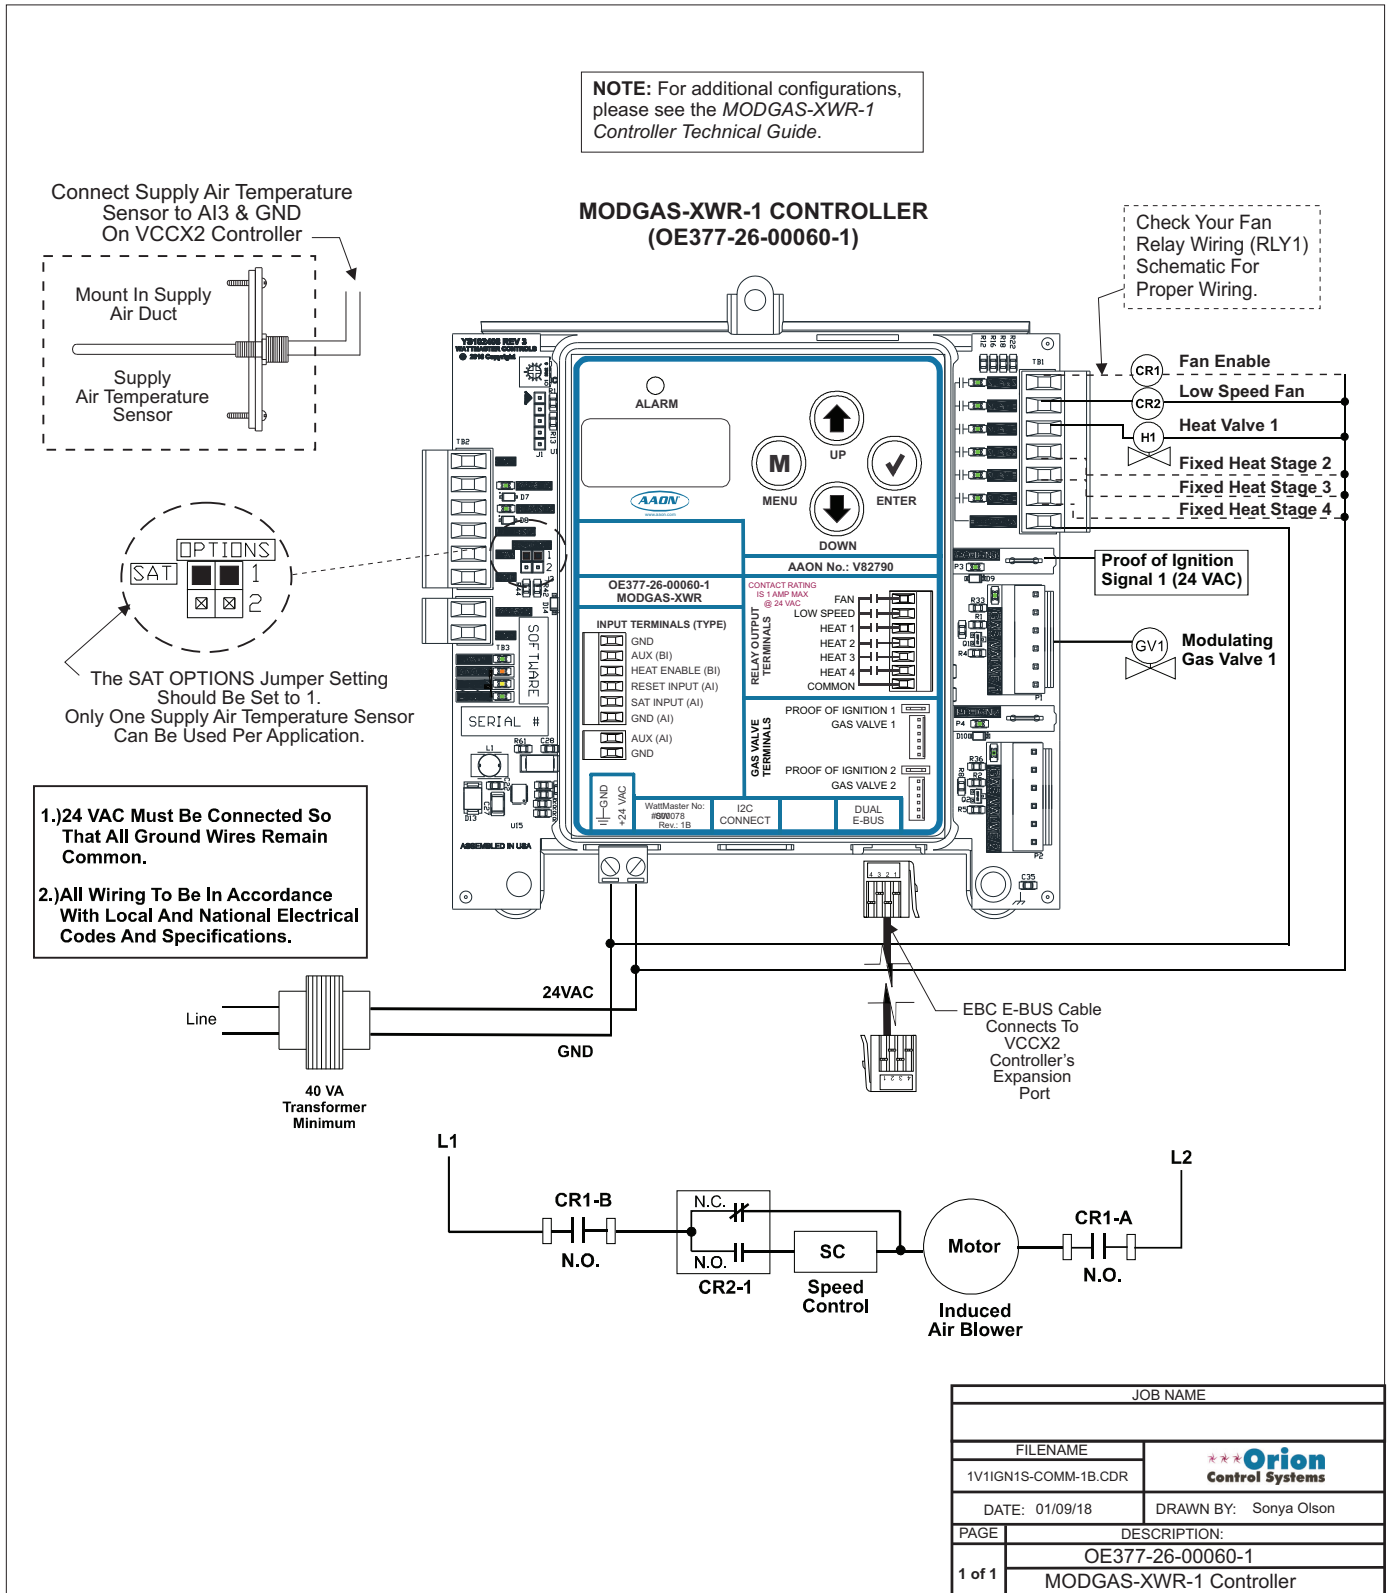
OE377-26-00060-1 One Modulating Valve, One Ignitor, One Stage Communicating Wiring
